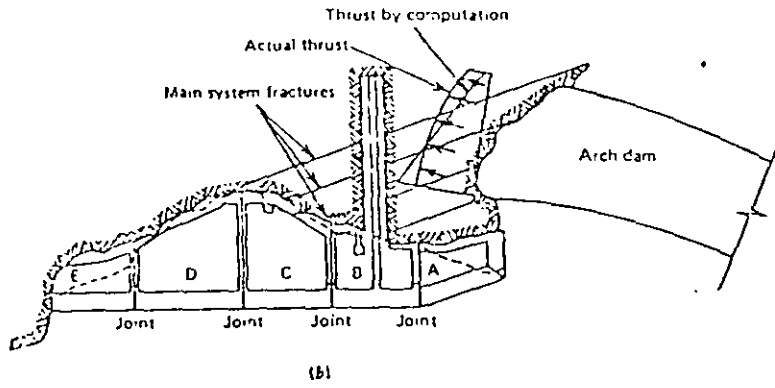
Reinforcing structure for the abutment of Canelles arch dam, Spain. [Reproduced from Alvarez (1977) with permission.] (b) A horizontal section.
